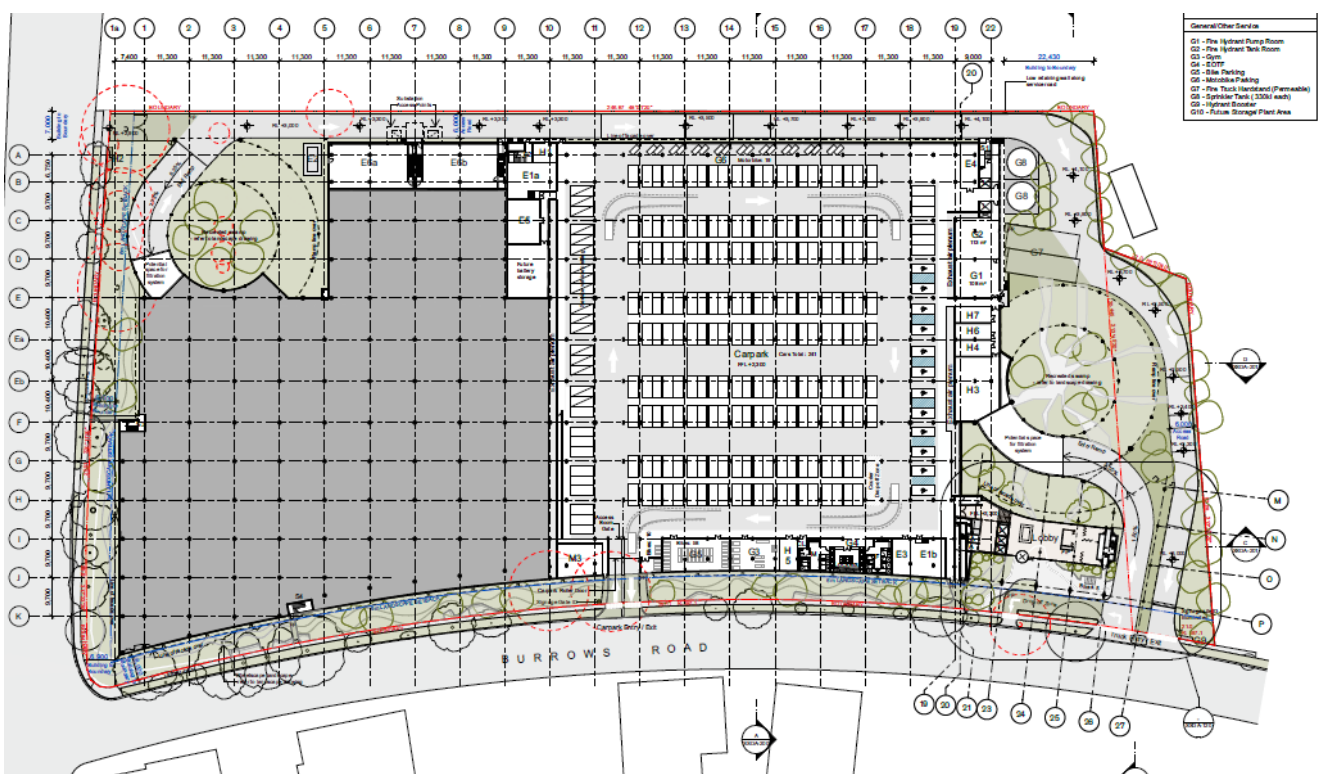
Proposed Development – Warehouse and Hardstand Floor Plan
